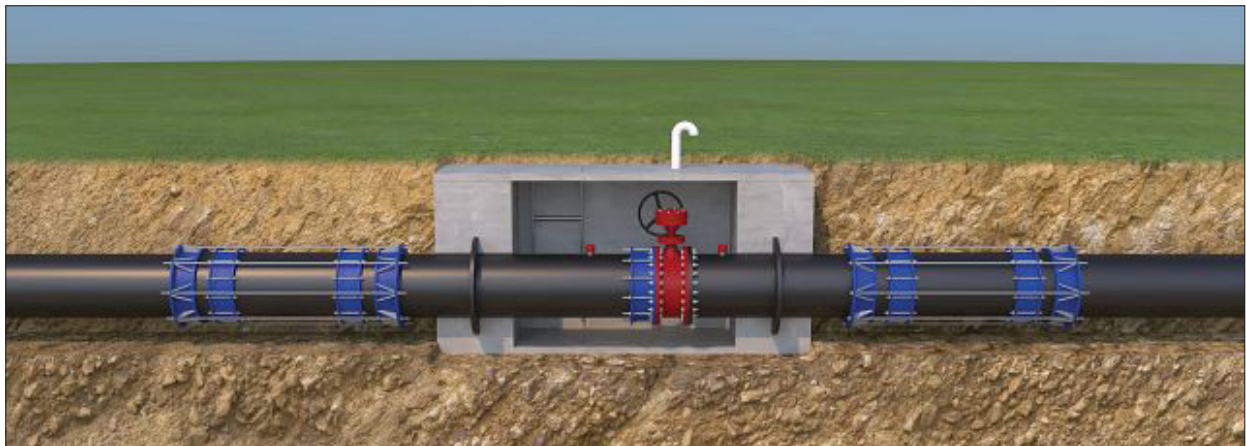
Conventional Bolted Sleeve-Type Coupling for Settlement and Valve Dismantling (Thrust taken by walls results in a large footprint)
